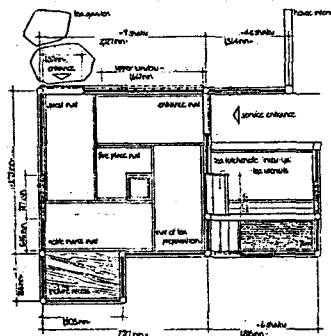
Floor plan of standard tea room (Engel, 1964: 287)
